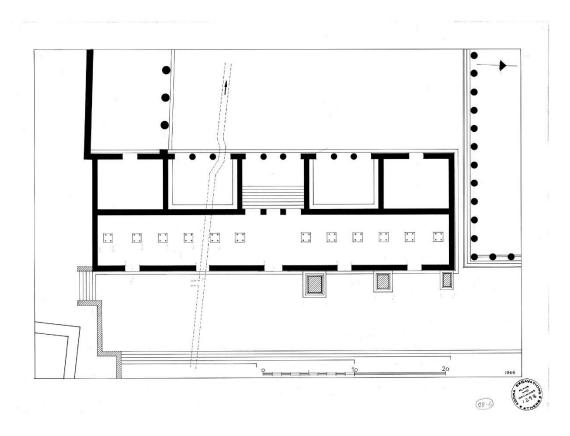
, Reconstructed plan of the East Building, by J.Travlos (Agora Excavations).
